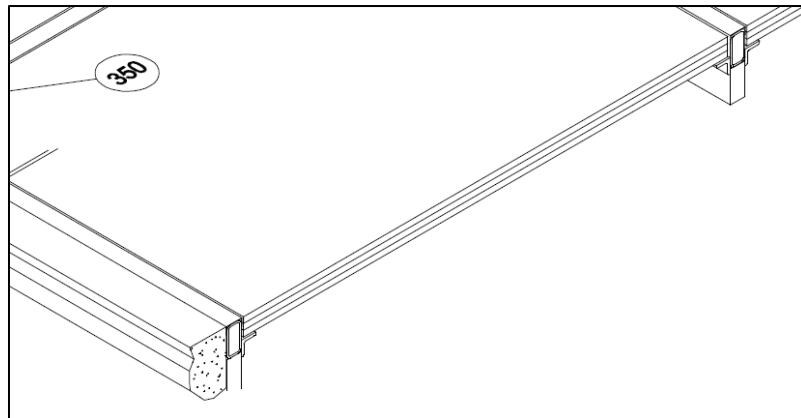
Typical glass floor panel structure (ISG, 2013)
